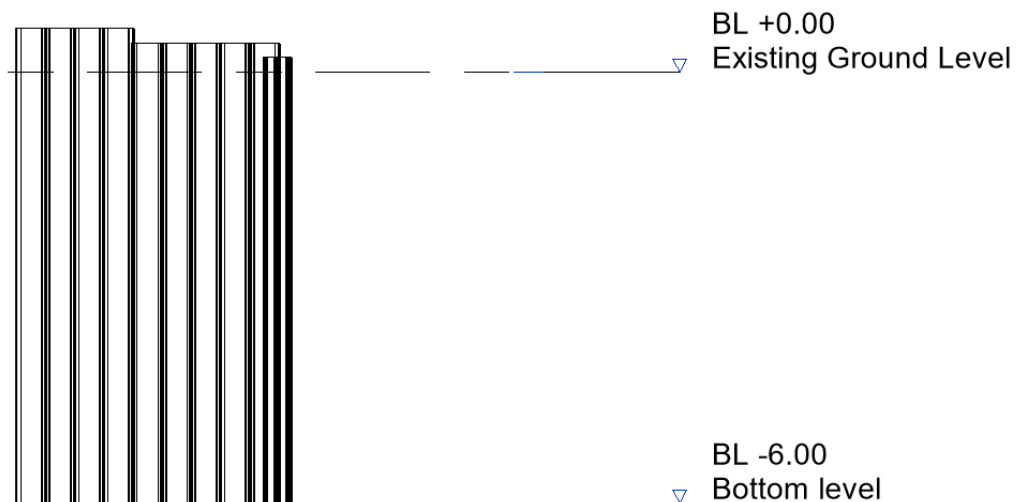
Elevation View of Steel Sheet Piling
